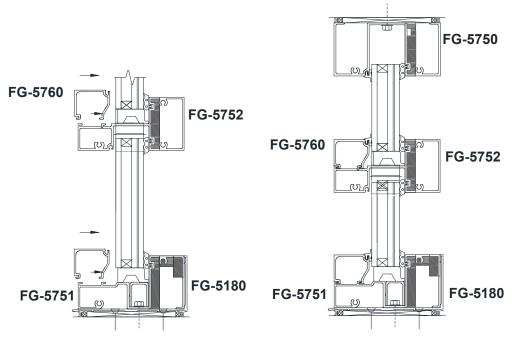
Dry Glaze Glass Stop Installation, Exterior Glaze
